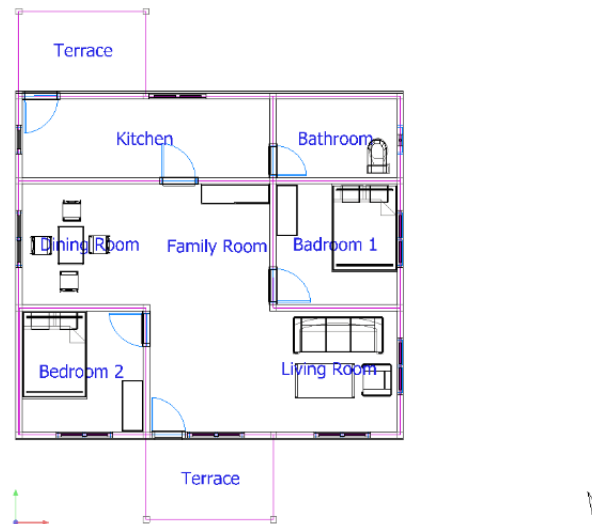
Ayu Setya Ningrum, House Plan, 2021.
